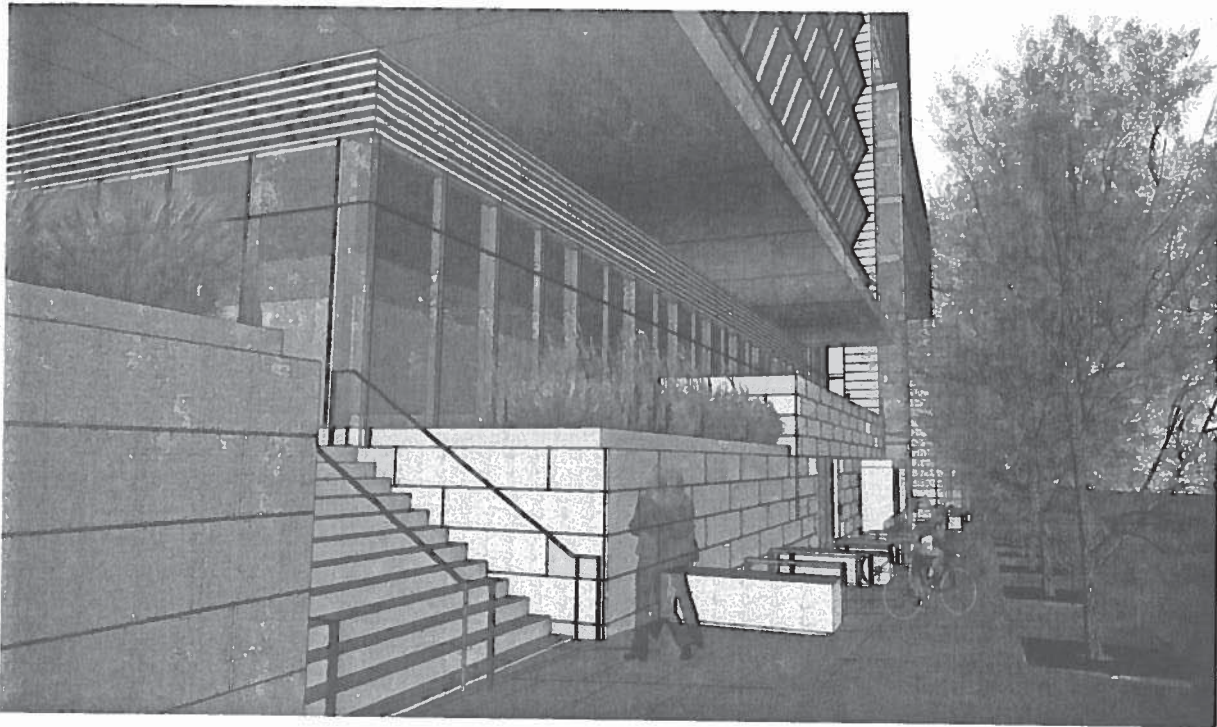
Hollis Street facade of the hotel and widened sidewalk.
